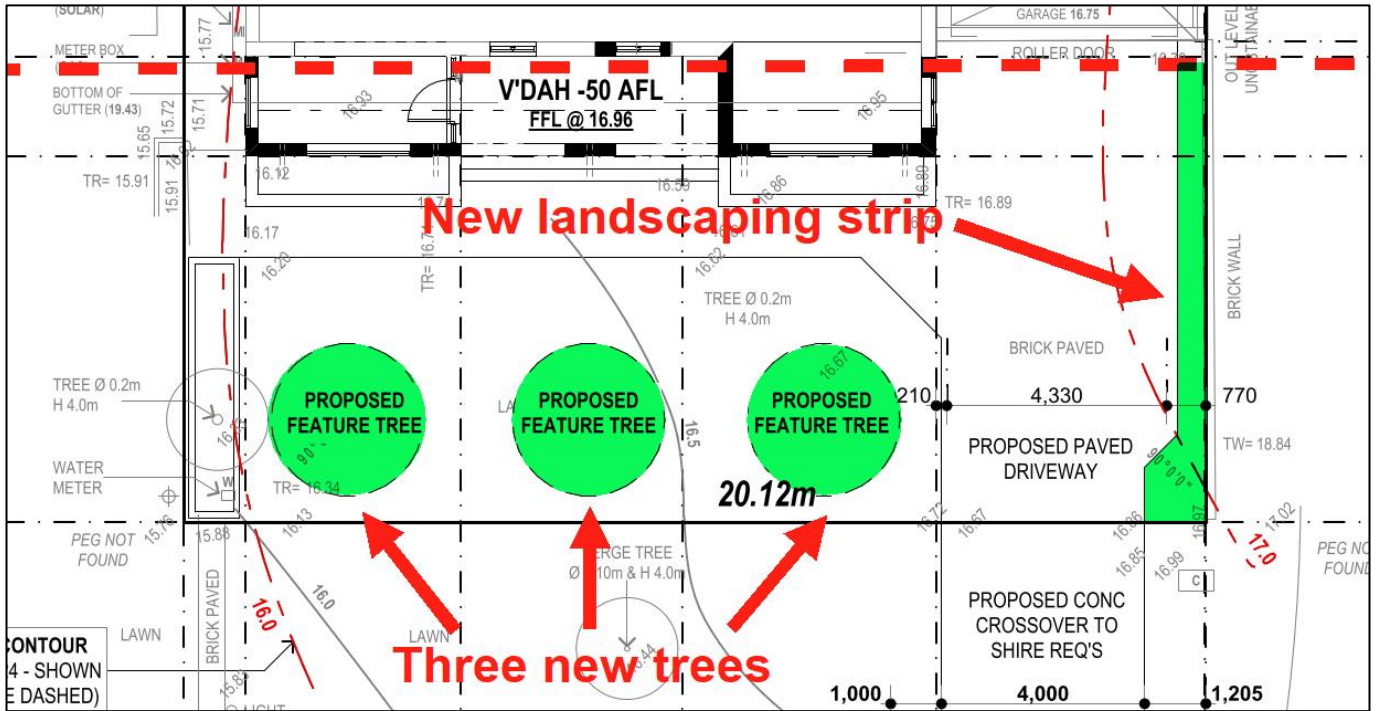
Marked-up site plan showing location of proposed three new trees and landscaping strip within the 9m primary street setback area.
